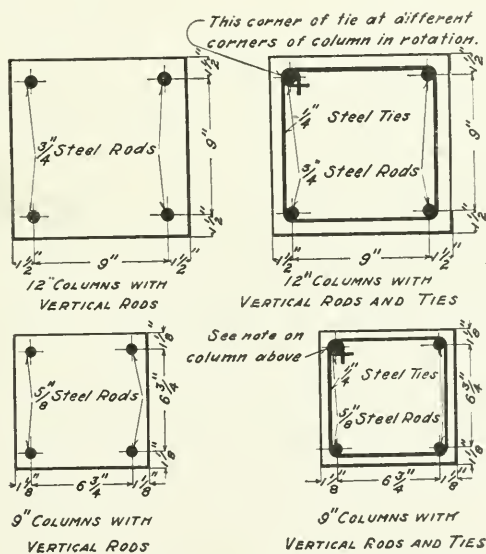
ARRANGEMENT OF REINFORCEMENT.
